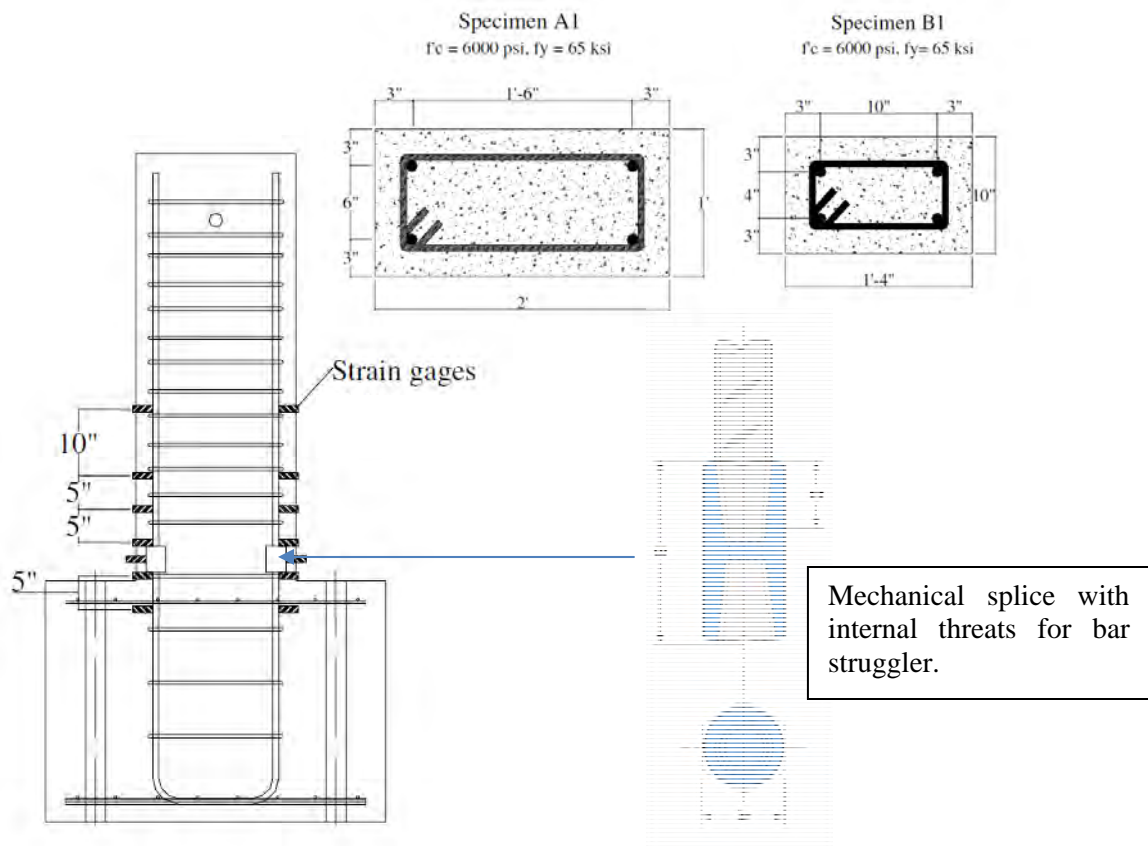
Elevation view of the Beam with the location of the mechanical splice and the two different cross section for each beam (Pampanin & Akguzel 2011)
